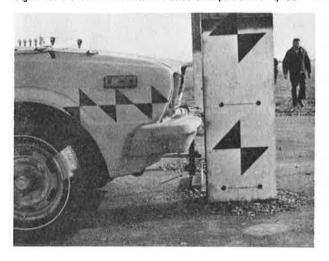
Test 355: final location of test sign and vehicle, looking downstream.
